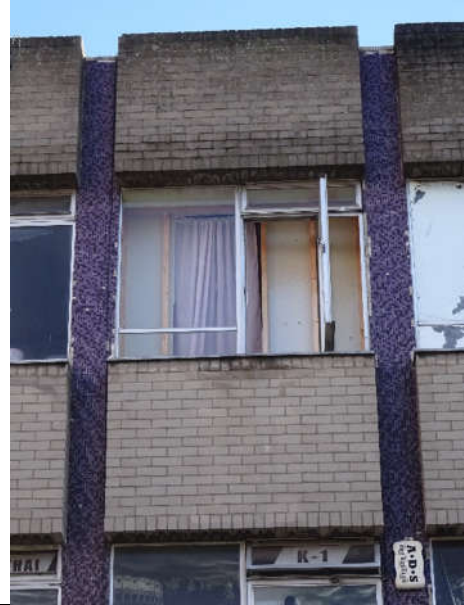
Detail showing concrete brick aprons separated by vertical mosaic bands.
